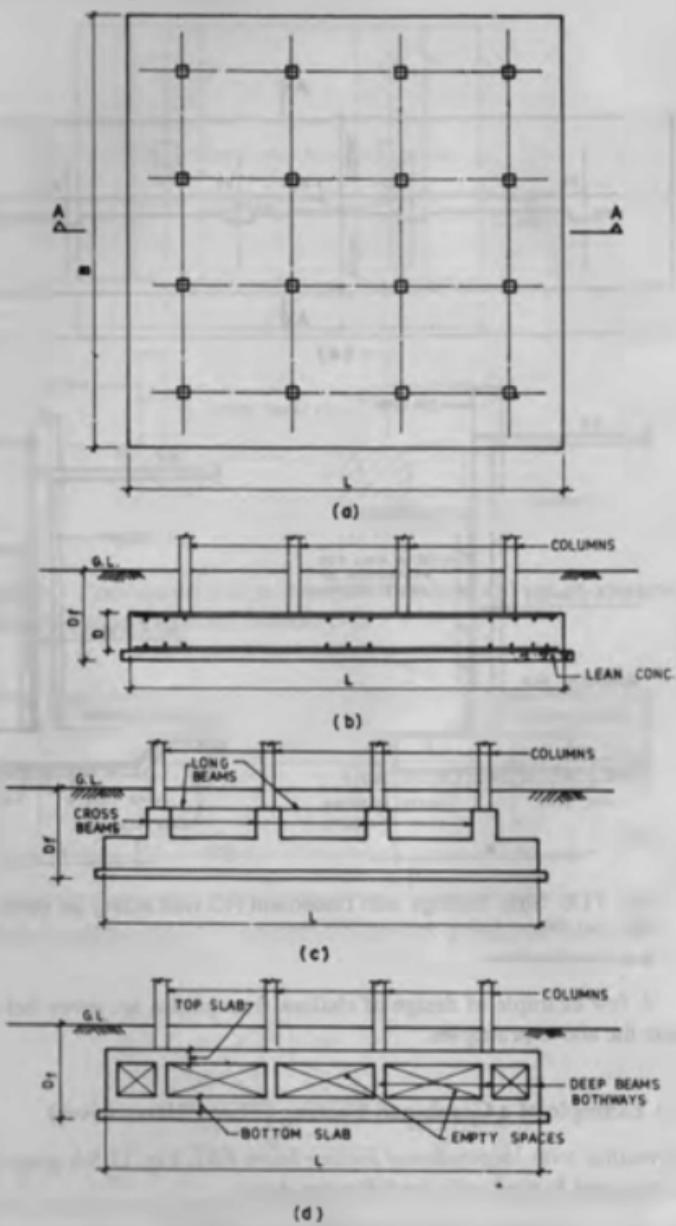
Raft foundation – different types. (a) Plan; (b) Solid slab type raft; (c) Slab-beam type raft; (d) Cellular raft or buoyant foundation.
